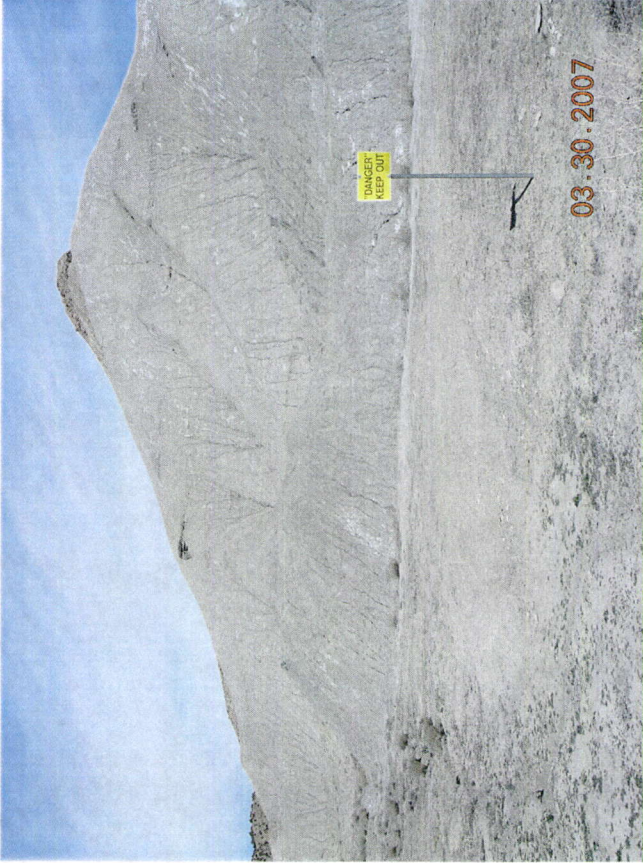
Although difficult to distinguish from surrounding hills, this shows some of the material excavated from the pit.
